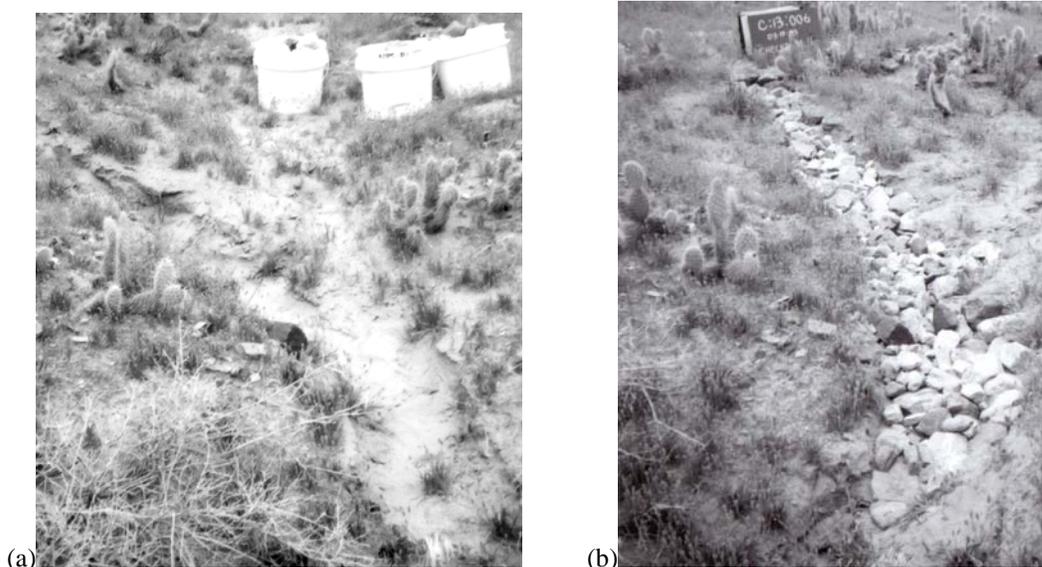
Site C:13:006, Checkdam 15: newly developed drainage prior to rock lining (Photo a). Photo b illustrates the drainage after treatment.
